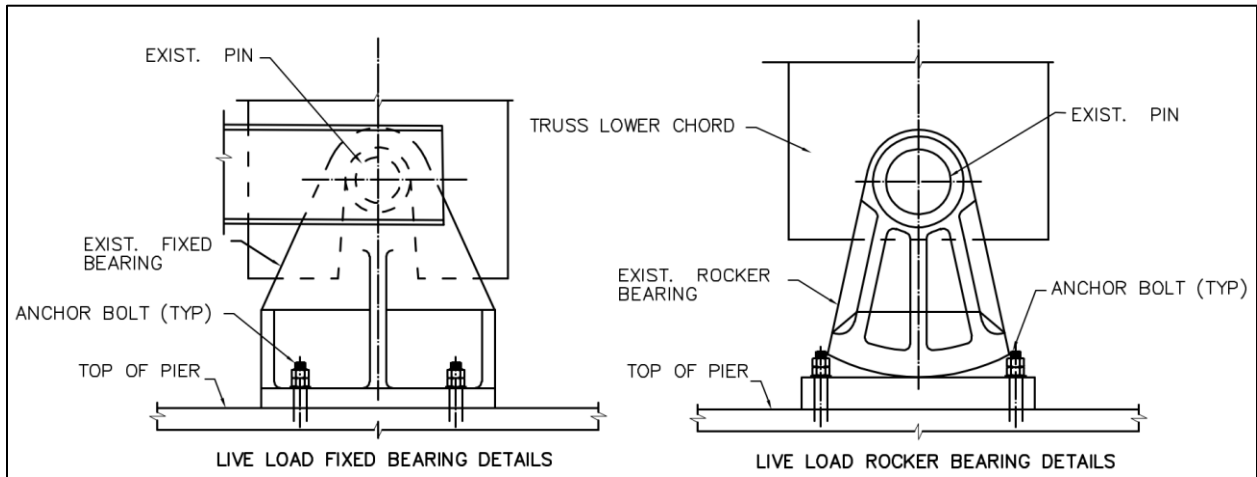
Typical sketch of the Live load shoe. West side fixed (left) and East side expansion (right)
